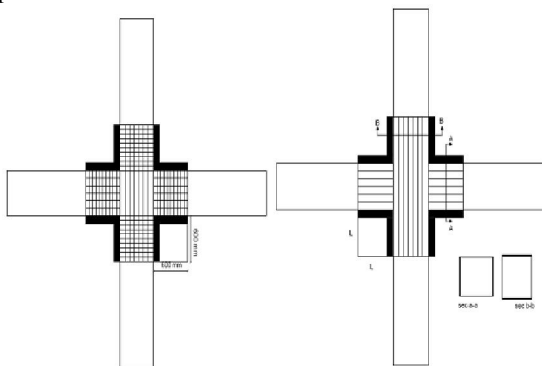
specimen of C₃-C₅ intermediate strengthened joints before and after beam and column wrapping
